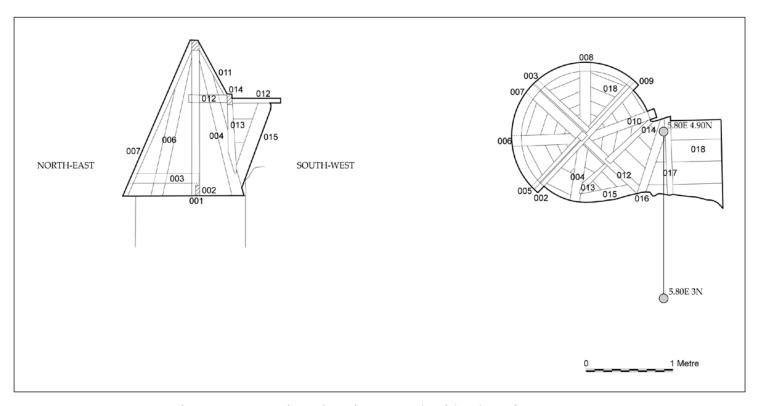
NW Facing Elevation & Underside Plan of NE Turret
